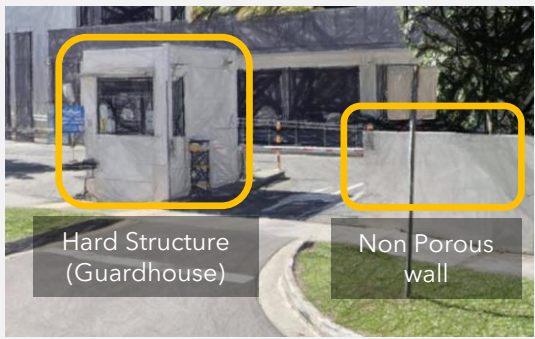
Vehicular Access with Hard Structure and Non Porous Wall
